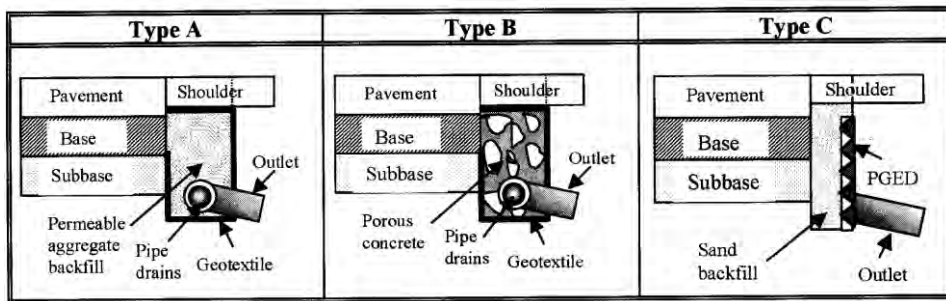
Geotextile filters and prefabricated geocomposite pavement edge drain applications (NCHRP 1-37A).
